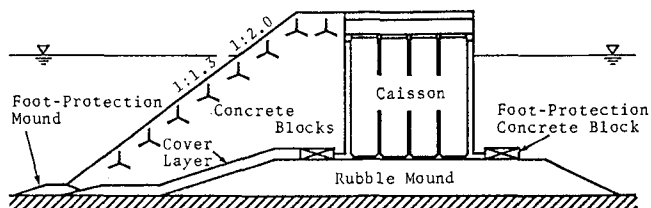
Idealized typical section of a breakwater with concrete block mound.
